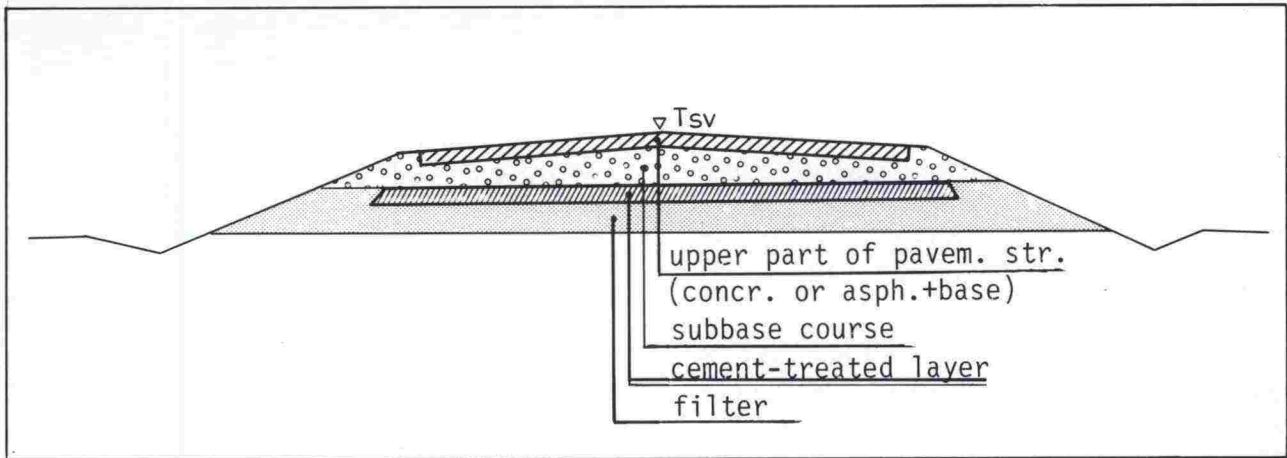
Suggestion for the Finnish sandwich structure on a compressible soil
